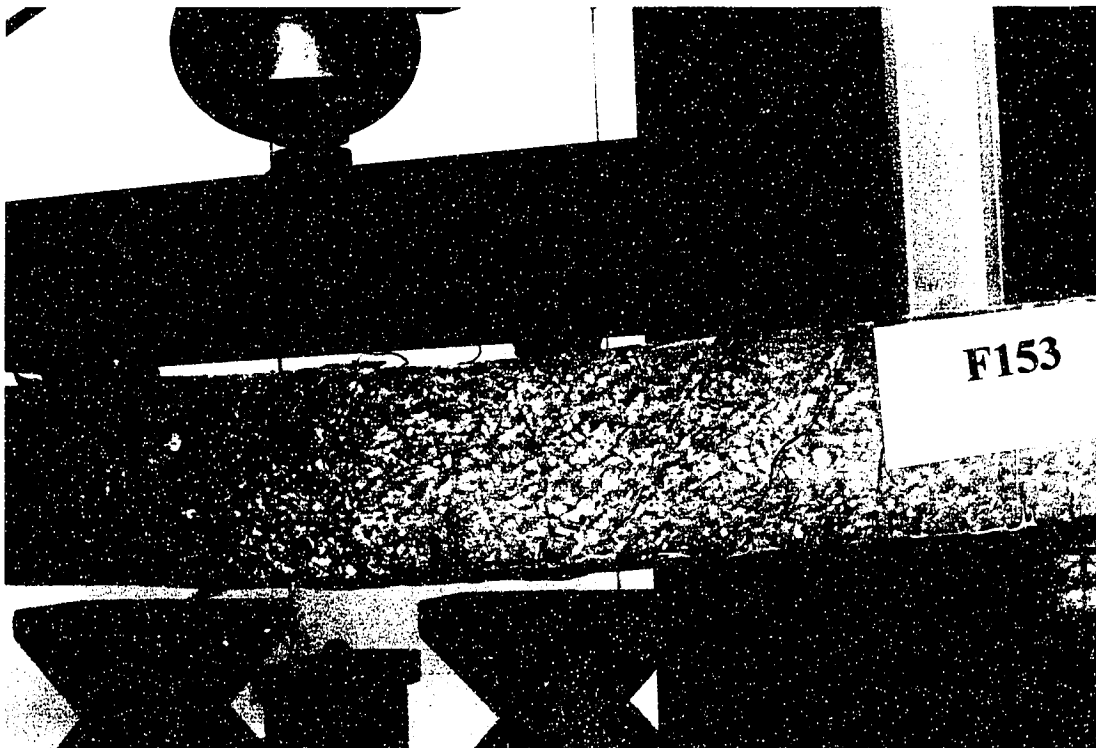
Photograph showing the mode of failure for beam F153 strengthened by 1 mm thick, 100 mm wide and 1100 mm long plate with 30 mm c/c spacing of stirrups
